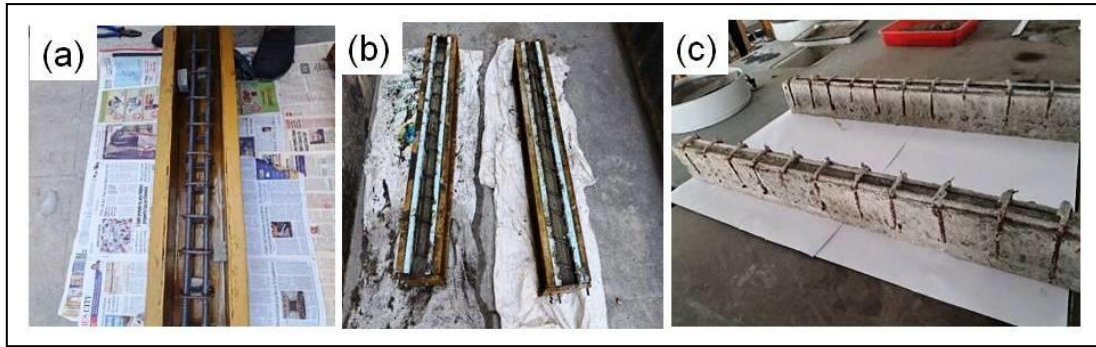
Casting of Control Beams without cover (a) View of mould with rebar cage (b) View of mould with XPS foams and poured concrete (c) View of beams without cover after de-moulding
